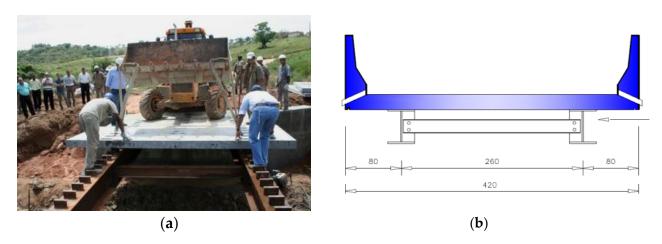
Concrete/steel bridge: Construction (a) and transversal view, in cm (b).
